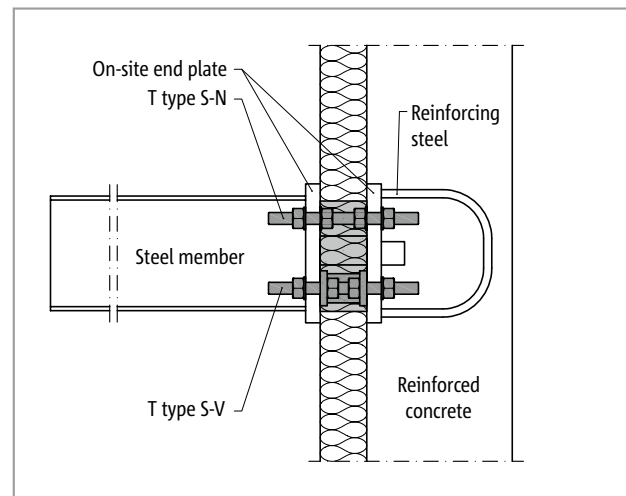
Schöck Isokorb® T type S-N and T type S-V modules for connection of steel structure to reinforced concrete frame
